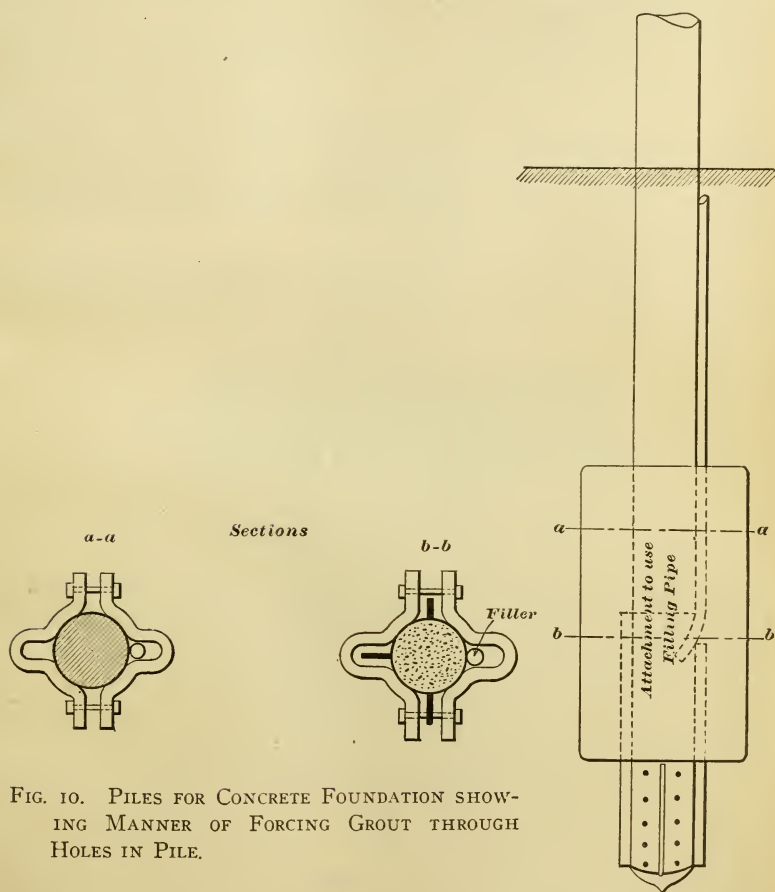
PILES FOR CONCRETE FOUNDATION SHOWING MANNER OF FORCING GROUT THROUGH HOLES IN PILE.
